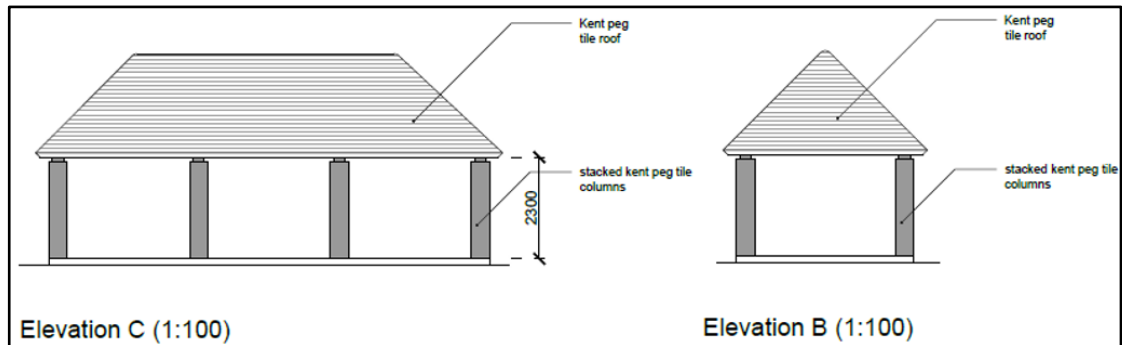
PROPOSED ELEVATIONS OF TENNIS LOGGIA (CLAGUE ARCHITECTS)
